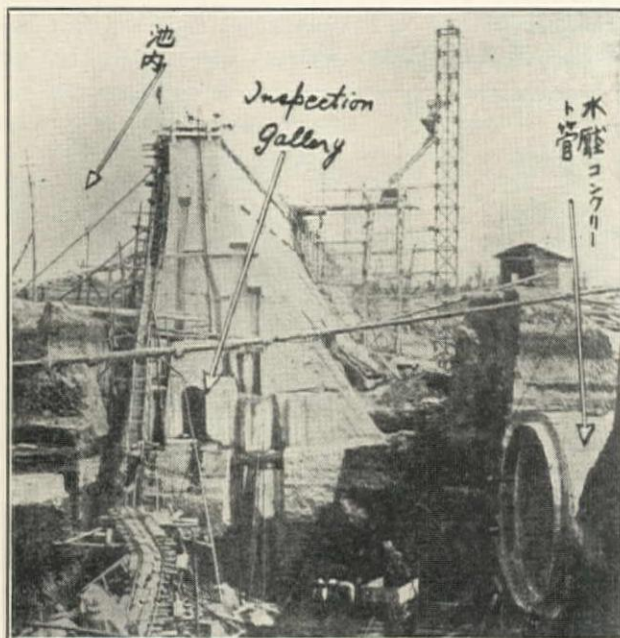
Construction View of 86-ft. Gravity Dam at Outlet of Regulating Reservoir, Showing Inspection Gallery, Concreting Tower, and Upper End of Reinforced Concrete Pressure Conduit
